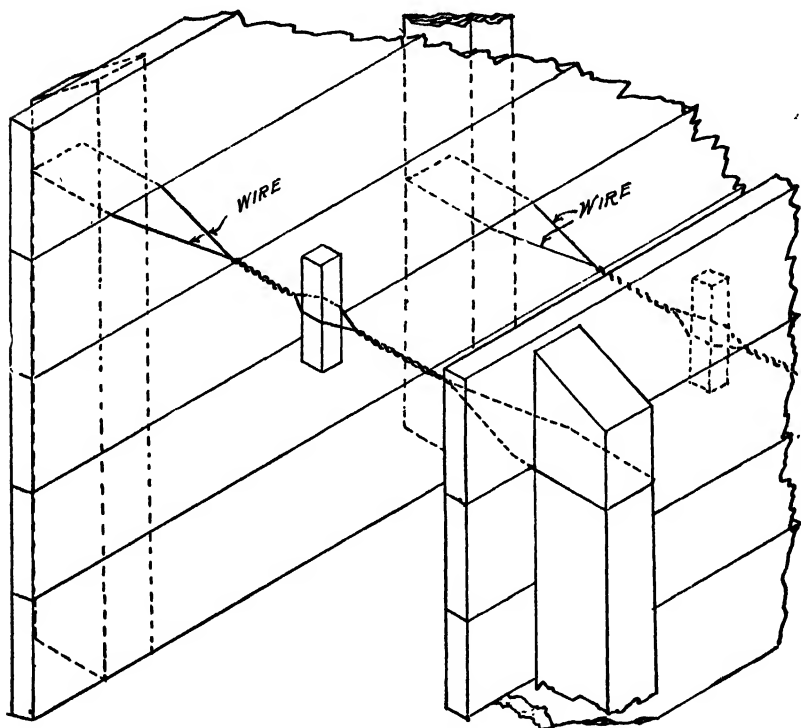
Method of Connecting Forms. (See p. 294.)
